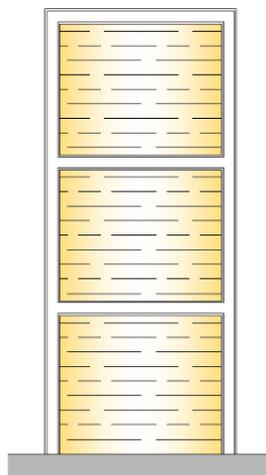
Steel Frame with Cross-Laminated Timber Infill Shear Wall - STSW.
